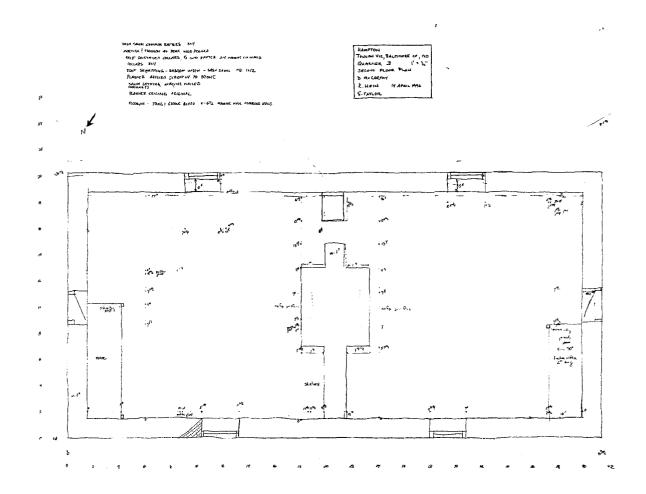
Hampton Quarter 3, field notes for second floor plan.
